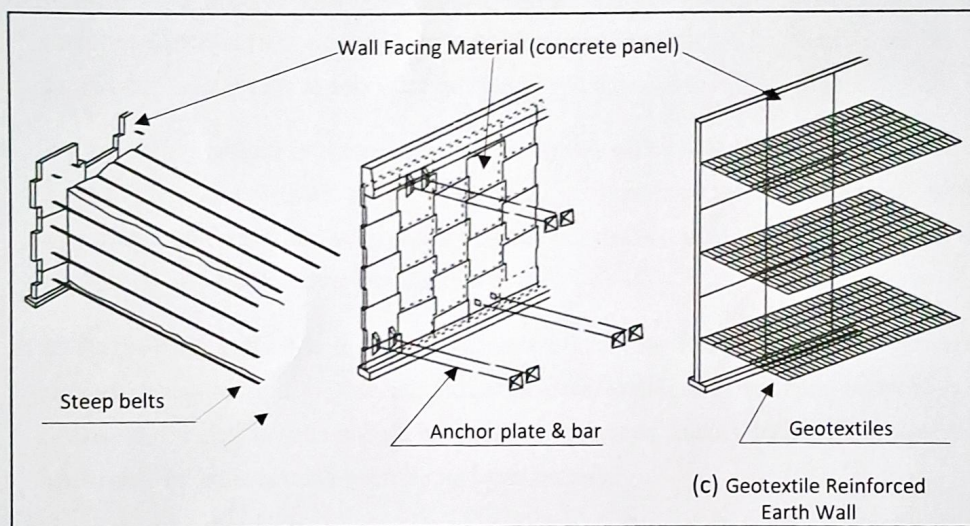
Schematic Drawing of Reinforced Earth Walls
